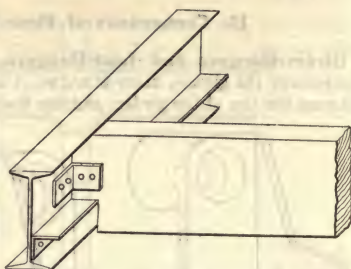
Wooden Beam Framed to I Beam with Shelf-angle
